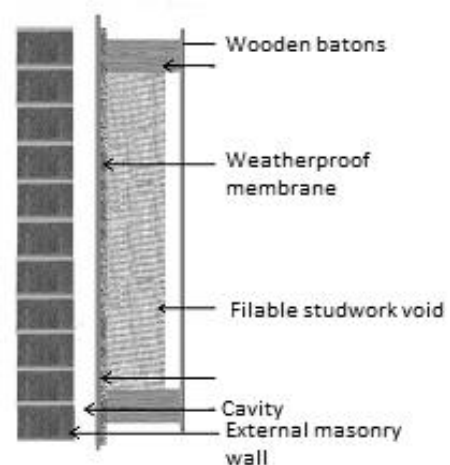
Timber frame construction with masonry cavity and uninsulated studwork
